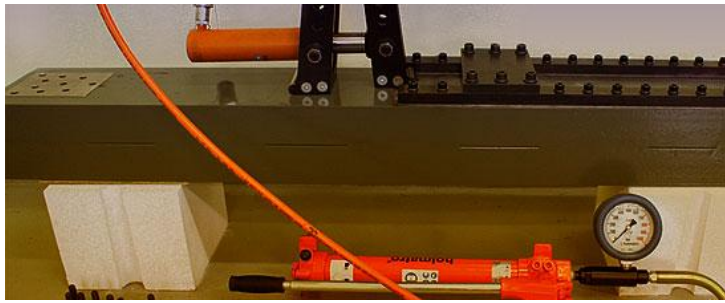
The Neoxe prestressing system with hydraulic jack and temporary anchor [37].
